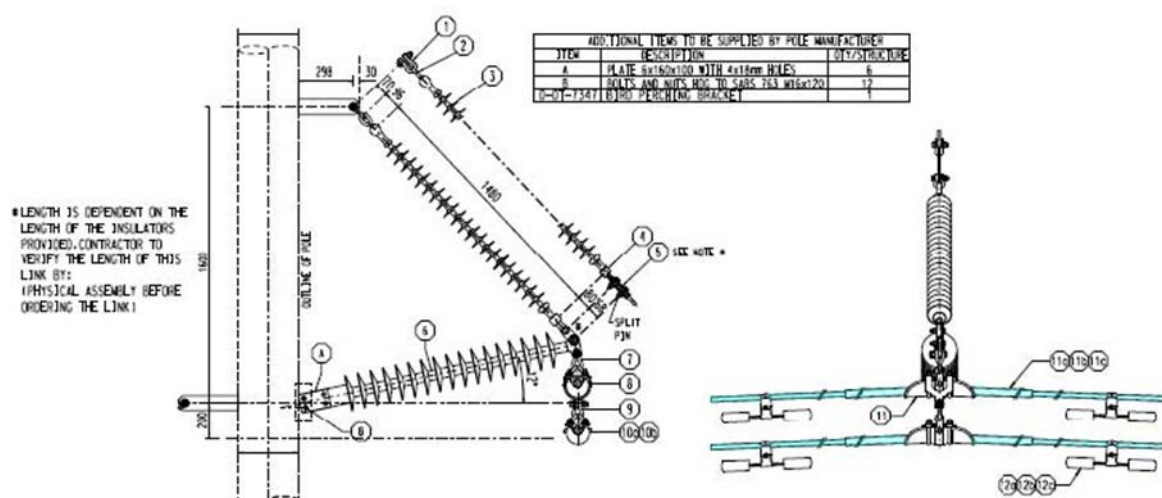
Phase Conductor Single Angle Suspension Assembly for Single “Conductor”
